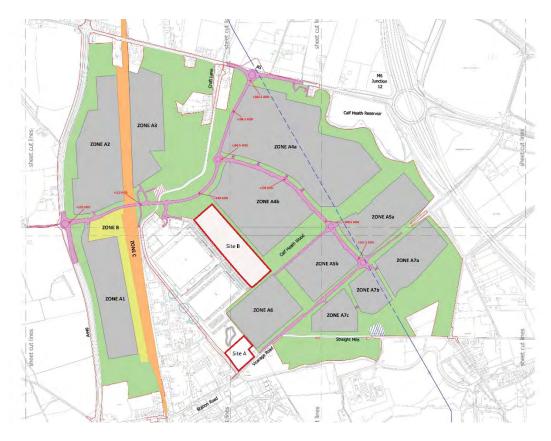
West Midlands Rail Freight Interchange (Parameter Plan)
